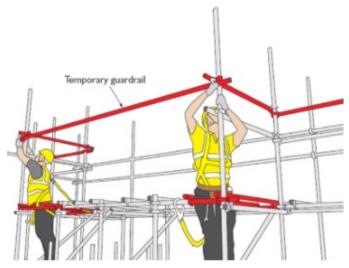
Guardrail pushed out horizontally from back scaffold. Guardrail extension (cantilever on horizontal tube must not exceed 1.20m).
